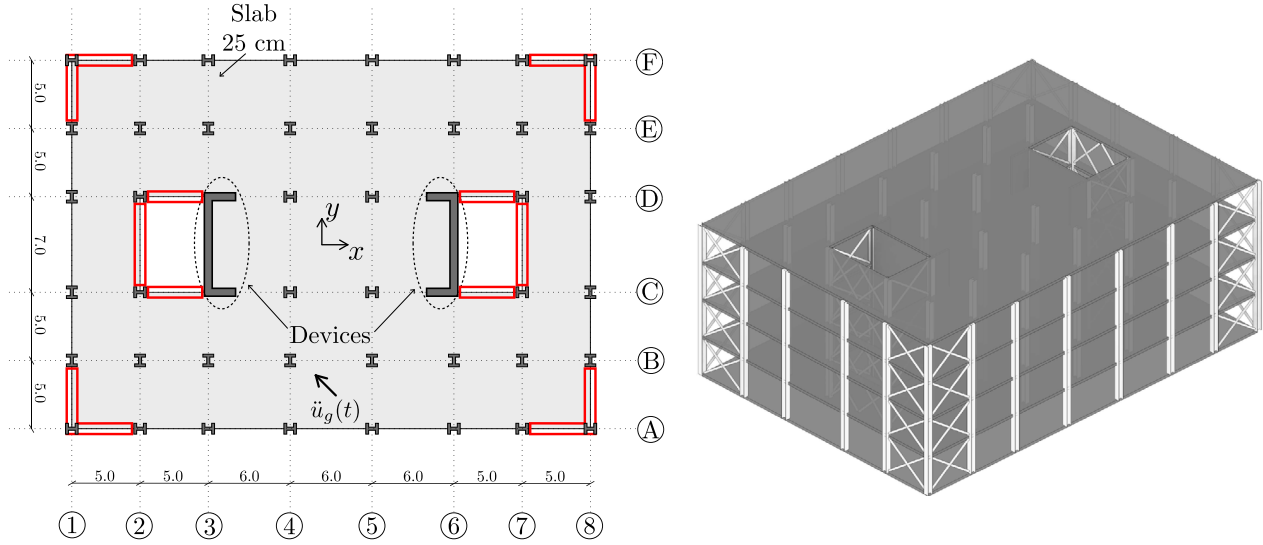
Floor plan (left) and isometric view (right) of the 4-story building. Example 3.
